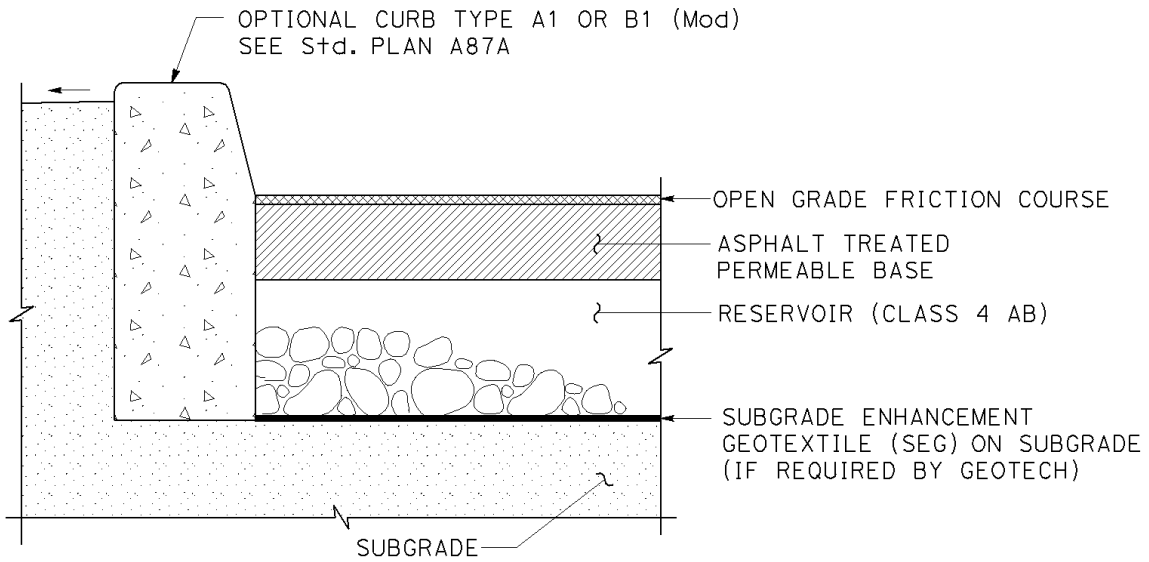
Pervious Asphalt Pavement (PAP) Typical Section
